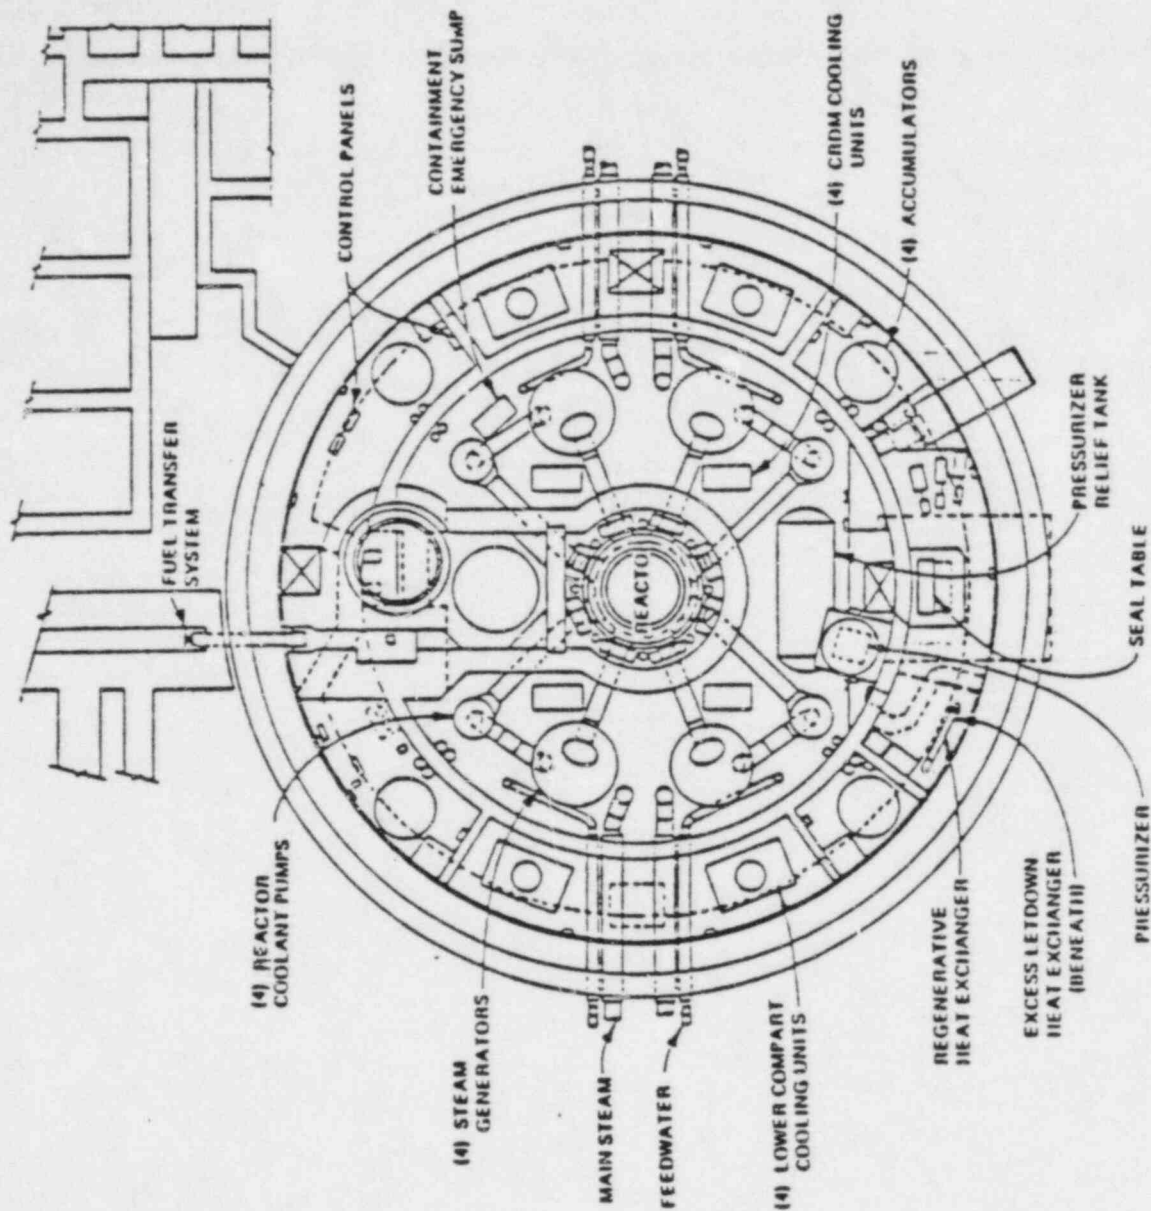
CONTAINMENT CROSS SECTION
